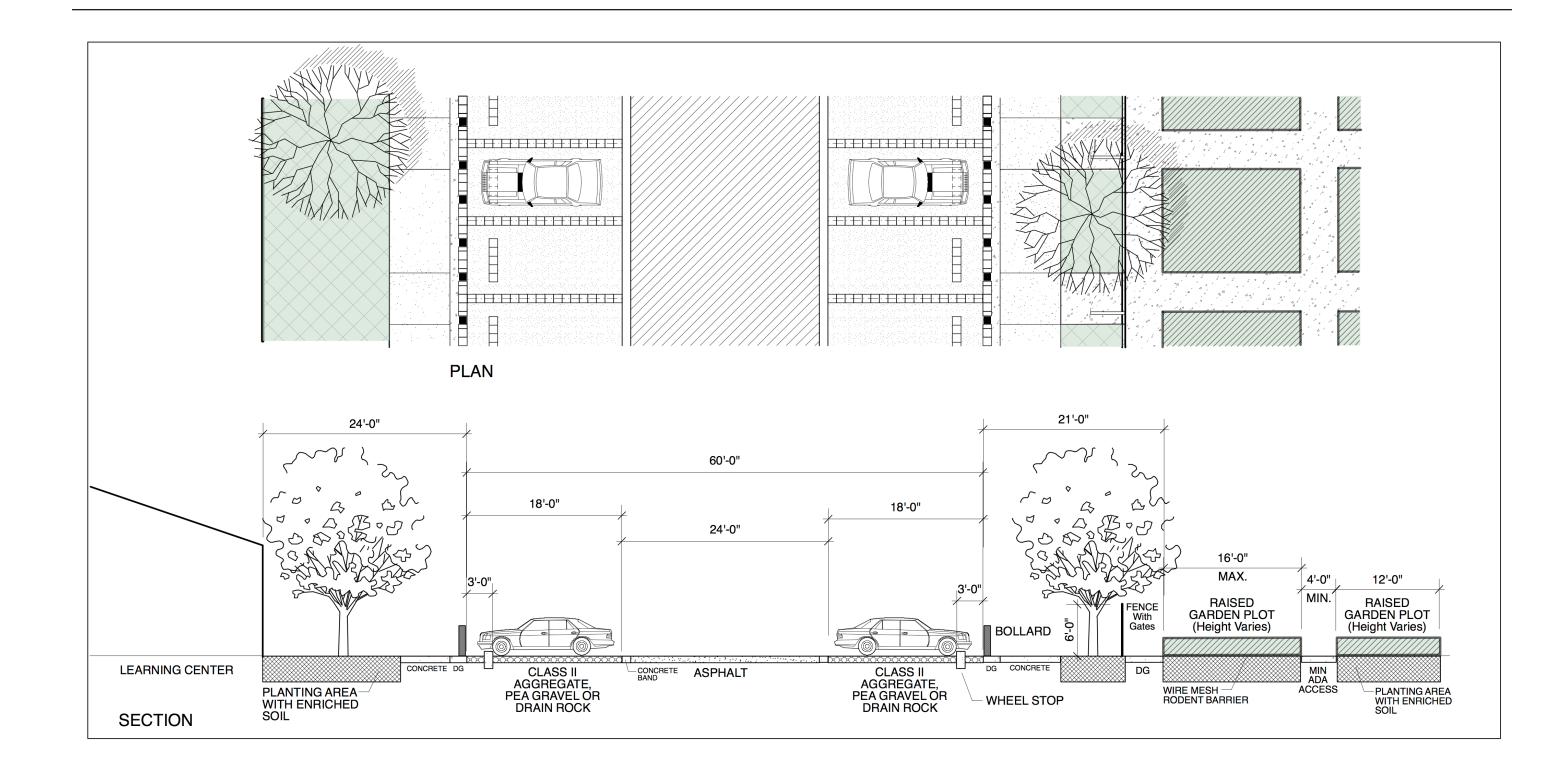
SUB-AREA 7 - TYPICAL PARKING PLAN & SECTION
